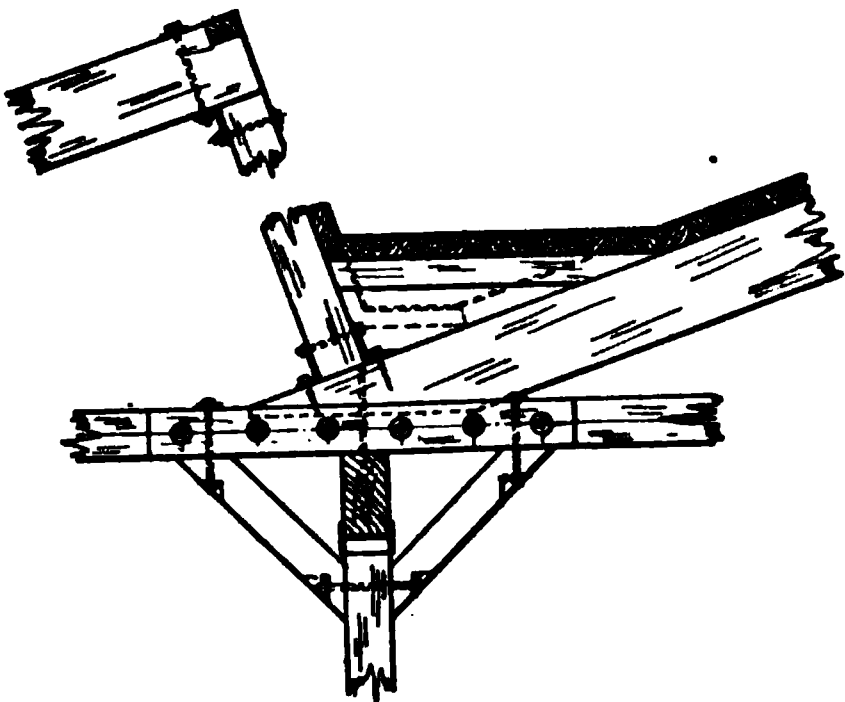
Detail of saw-tooth frame—inclined face with timber ties.
